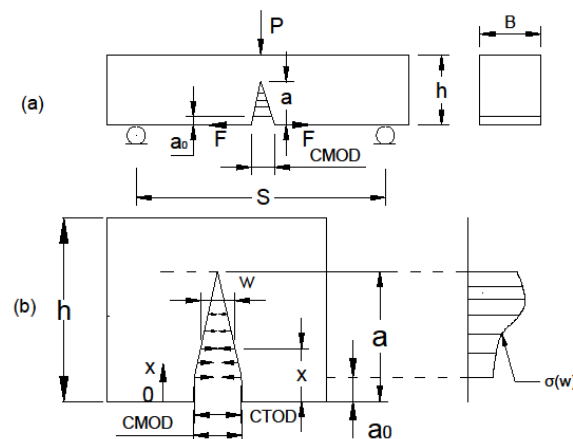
(a) notched SFRC beam in three-point bend; (b) fibre tensile stress in cracked section
